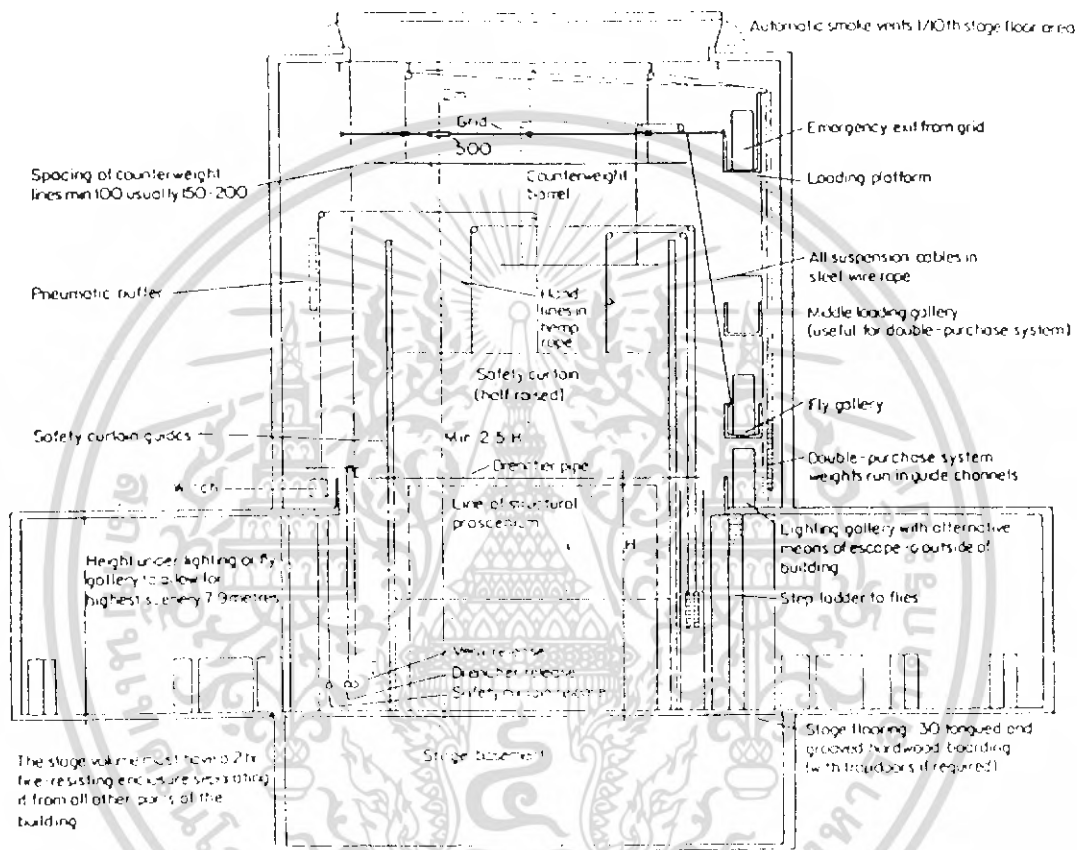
Typical section through stage and fly tower looking towards auditorium
